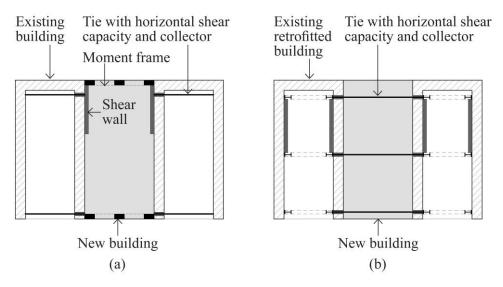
Plans of two existing buildings with a new building between them. In (a) the structure in the new building is adequate for all three buildings, while in (b) the new building has no lateral load-resisting structure and relies on the retrofit structure of the existing buildings.
